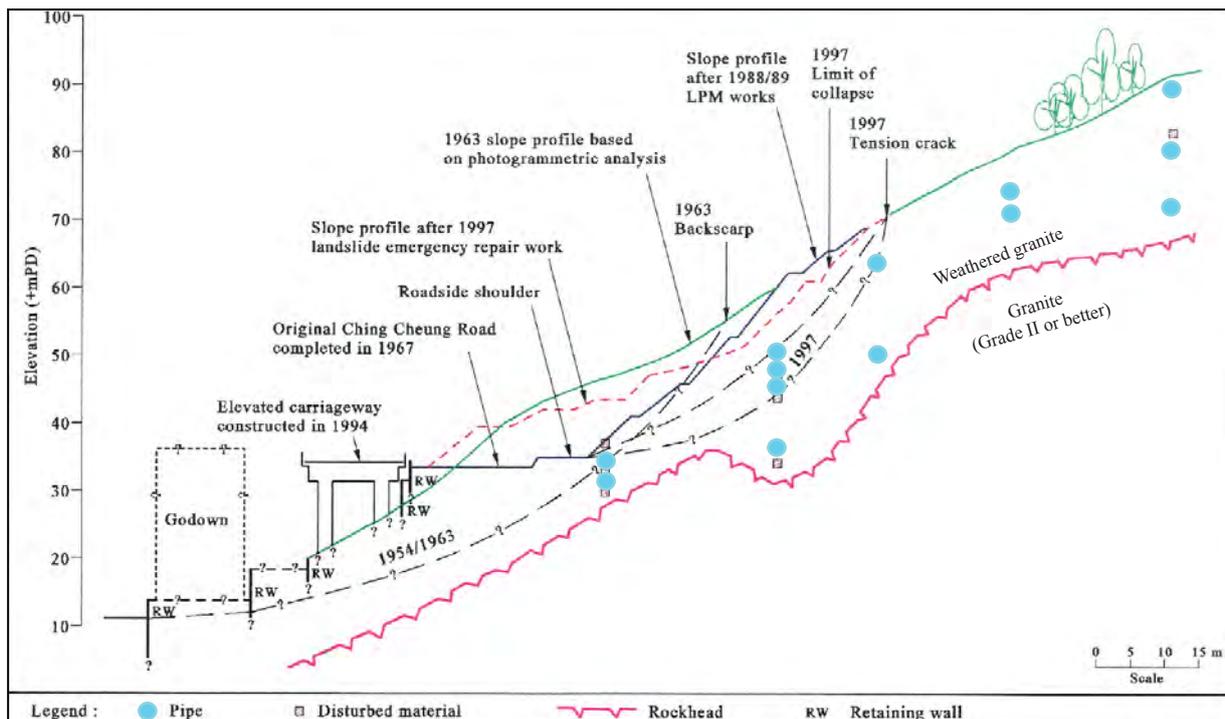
Section through 1997 Ching Cheung Road landslide showing previous failures and the large number of soil pipes encountered in drillholes (HAPL, 1998b)
